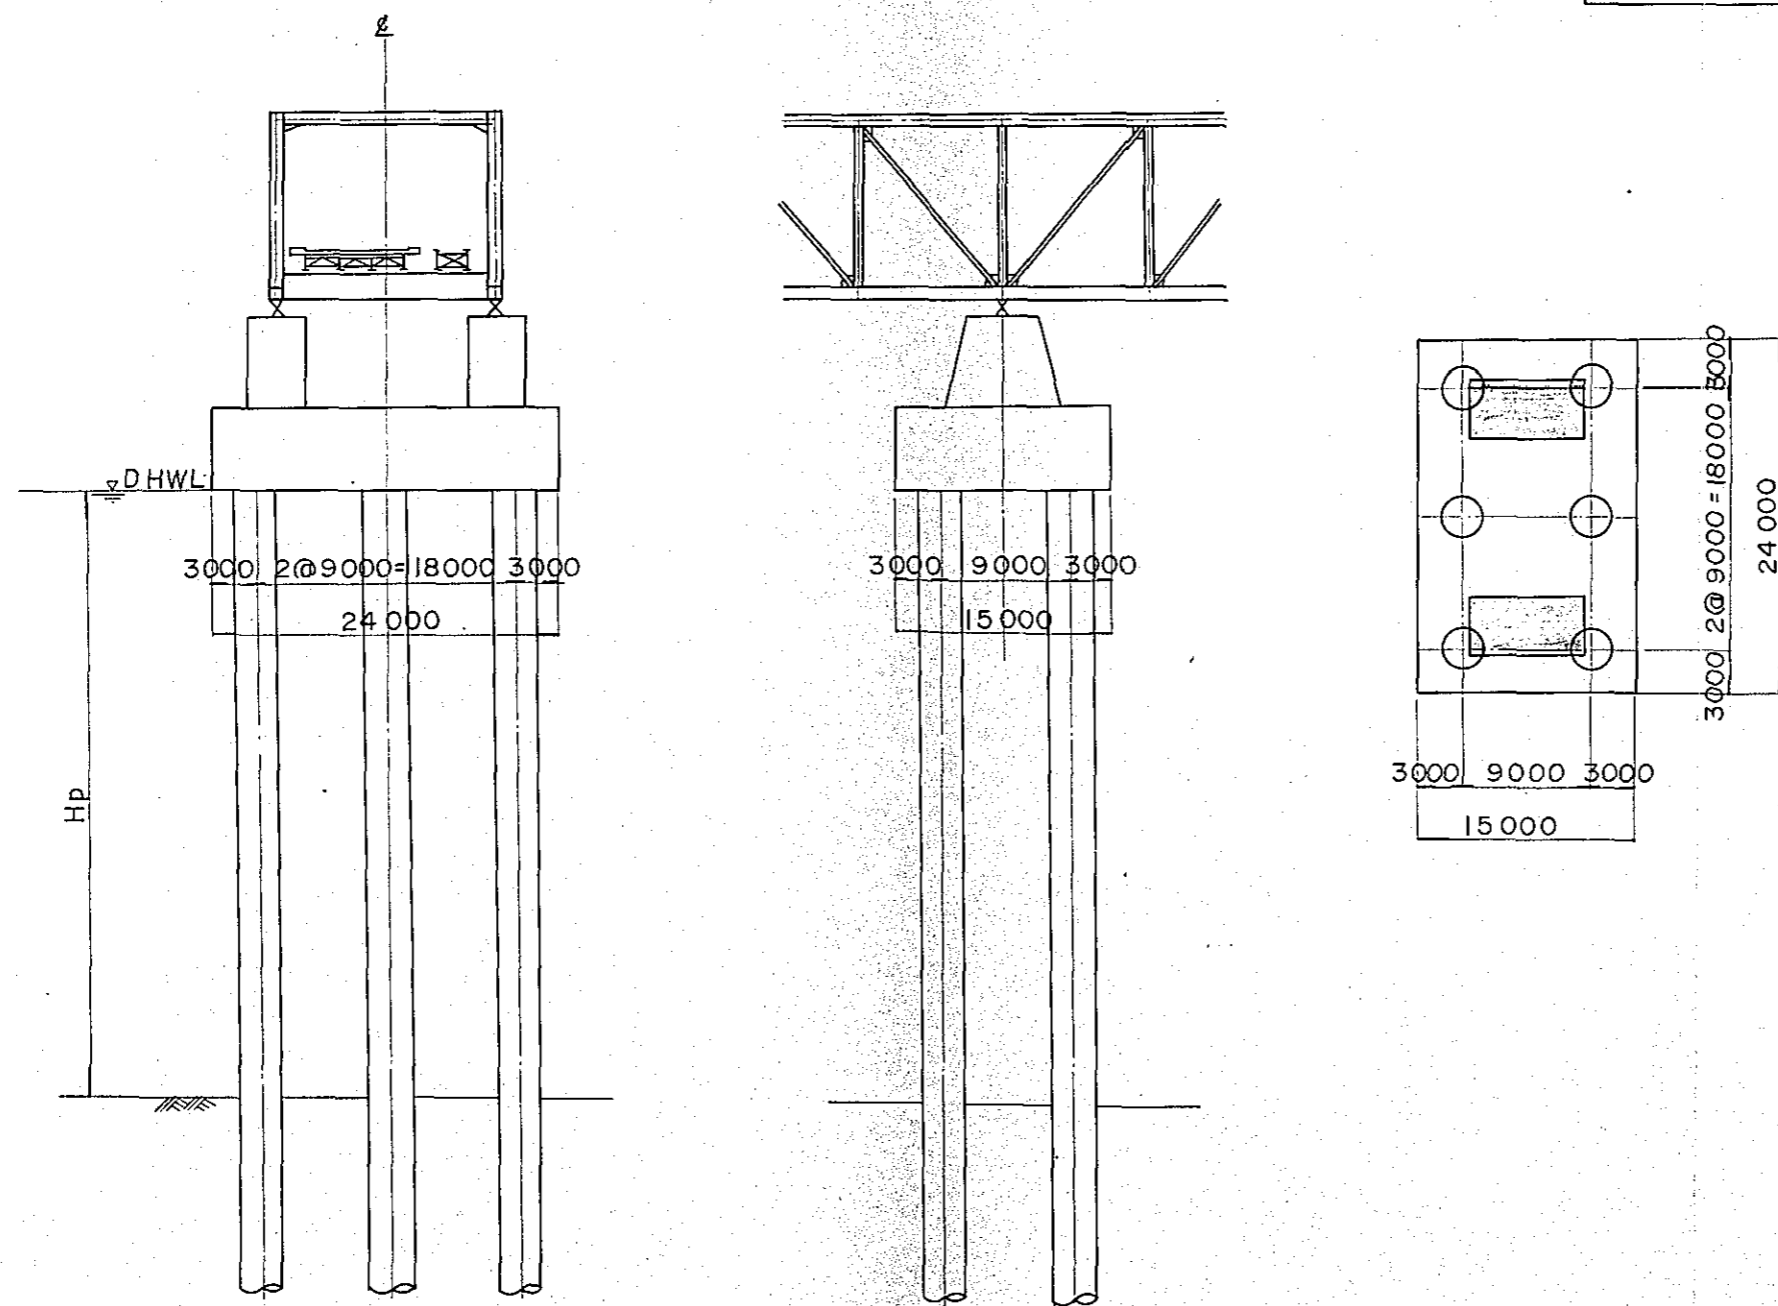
Outline of structure of multi-pile foundation $\phi 3.0\text{m}$
